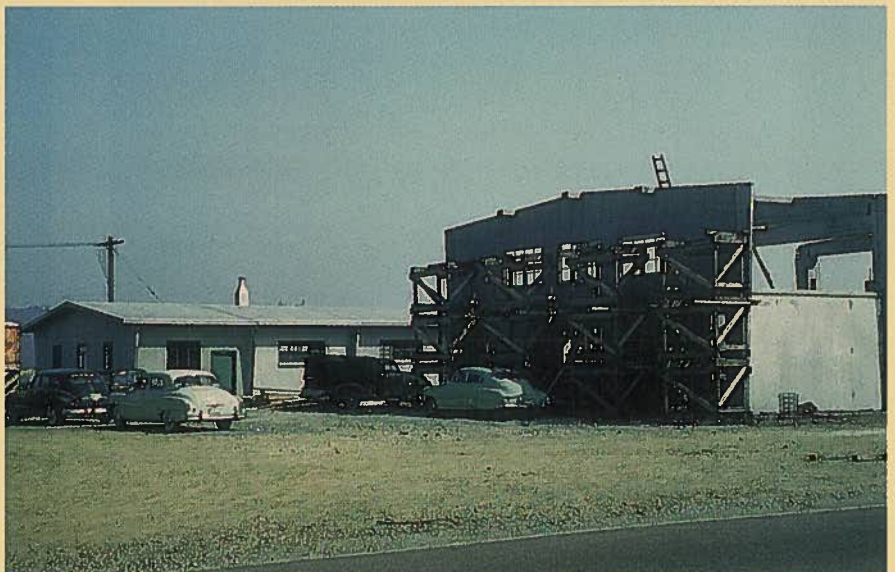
The original Concrete Technology precast concrete plant and machine shop, circa 1952.
